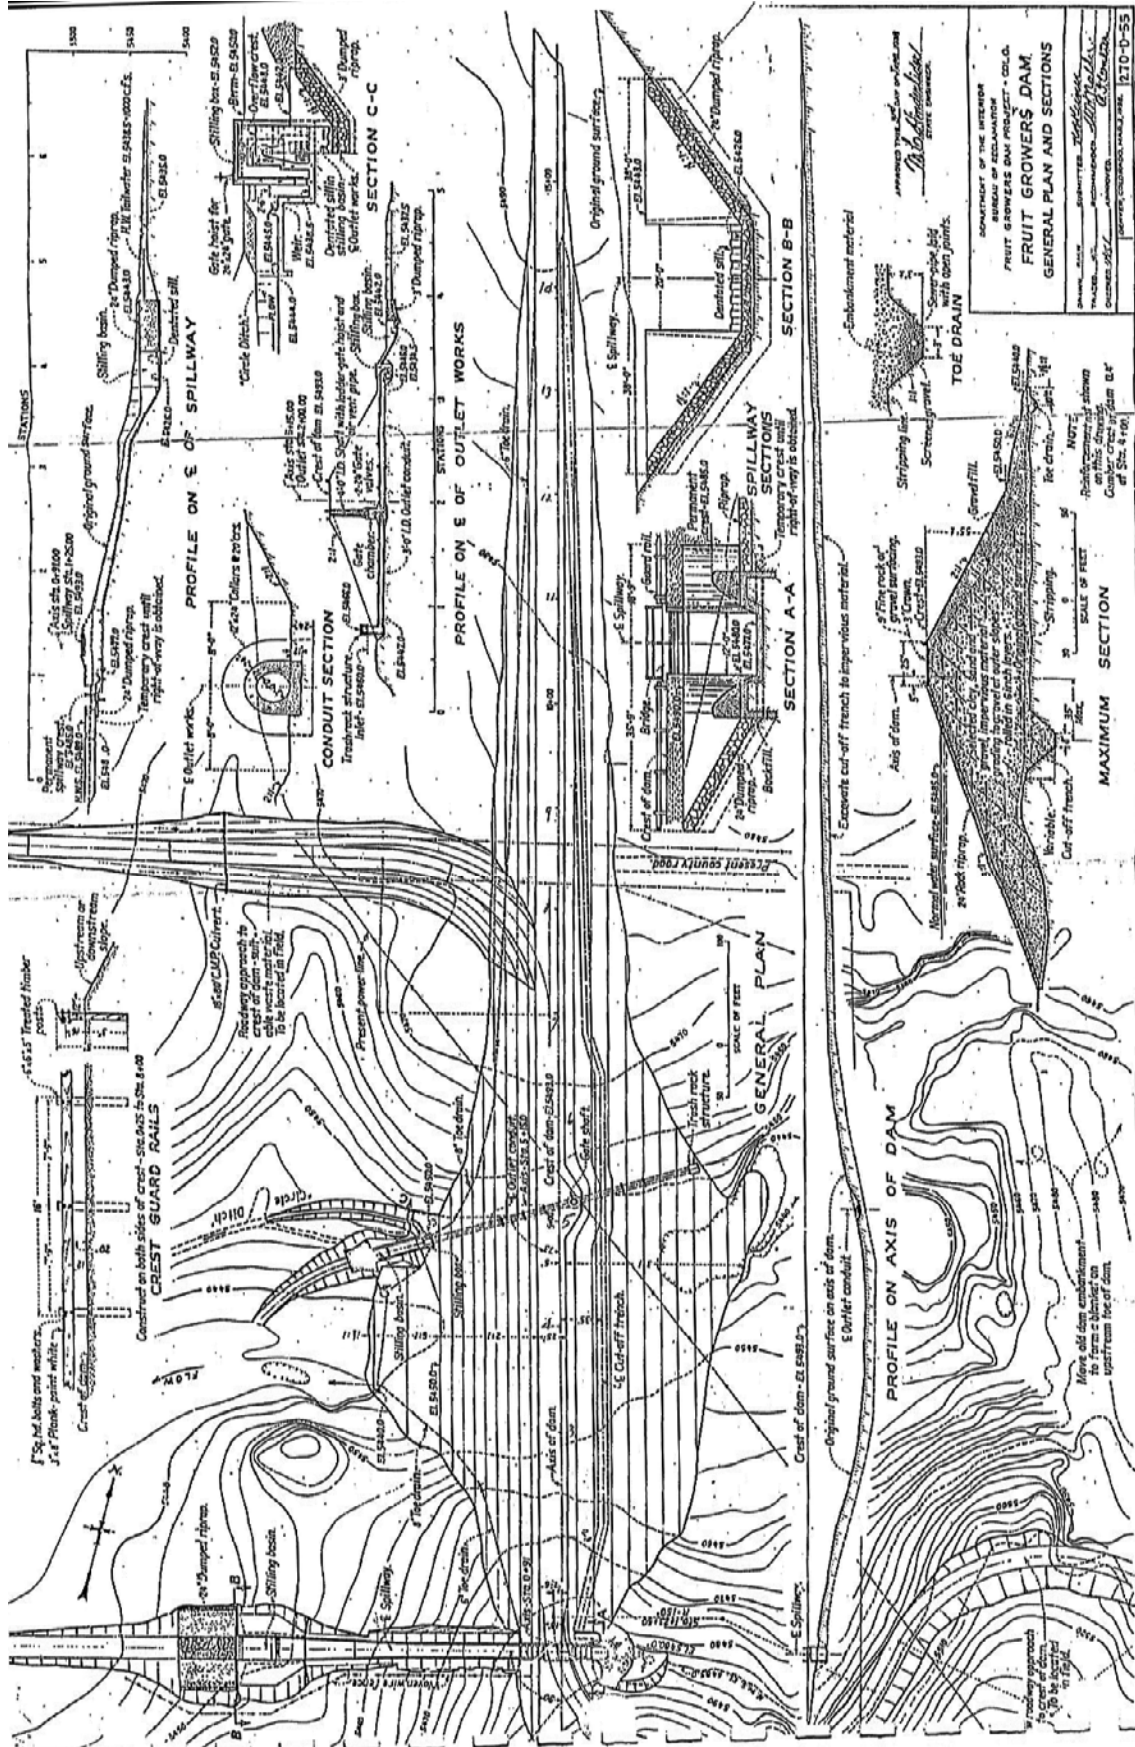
General plan view and cross sections of Fruitgrowers Dam.
